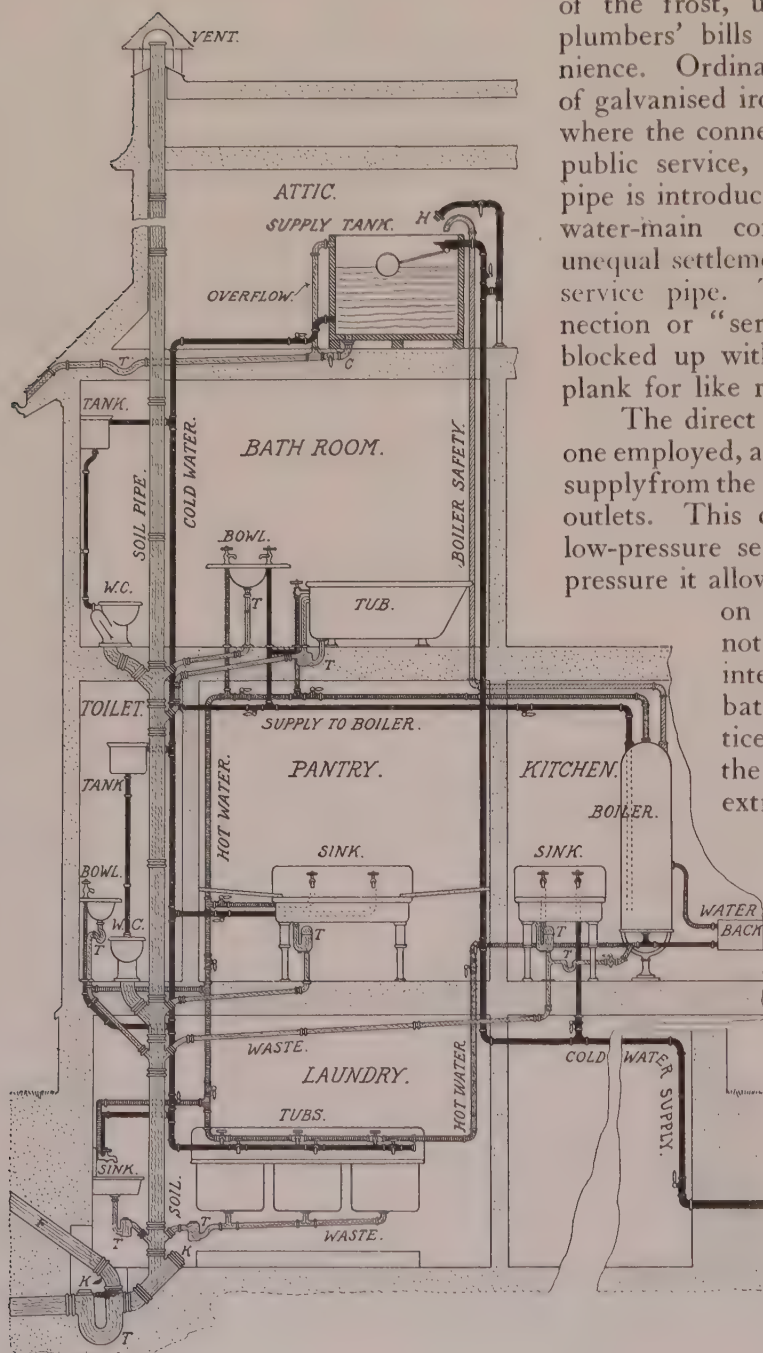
Section showing the plumbing of a house by the system which avoids the use of the back vent. It could be installed, using enamelled fixtures with best workmanship and materials, for about \$600. If soapstone tubs were used it would reduce the cost
